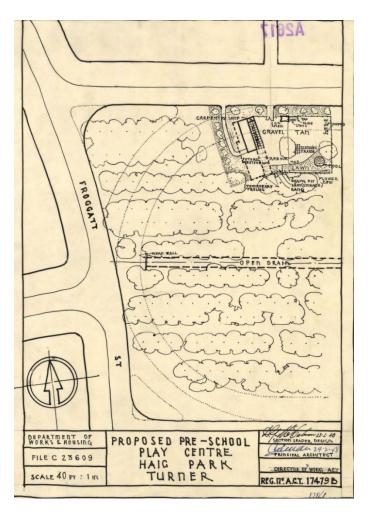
1948 Plan of Turner Preschool within Haig Park Title: Turner Preschool – proposed preschool play centre – establishment in Haig Park (Source: NAA:A2617, Section 150/17479A)
